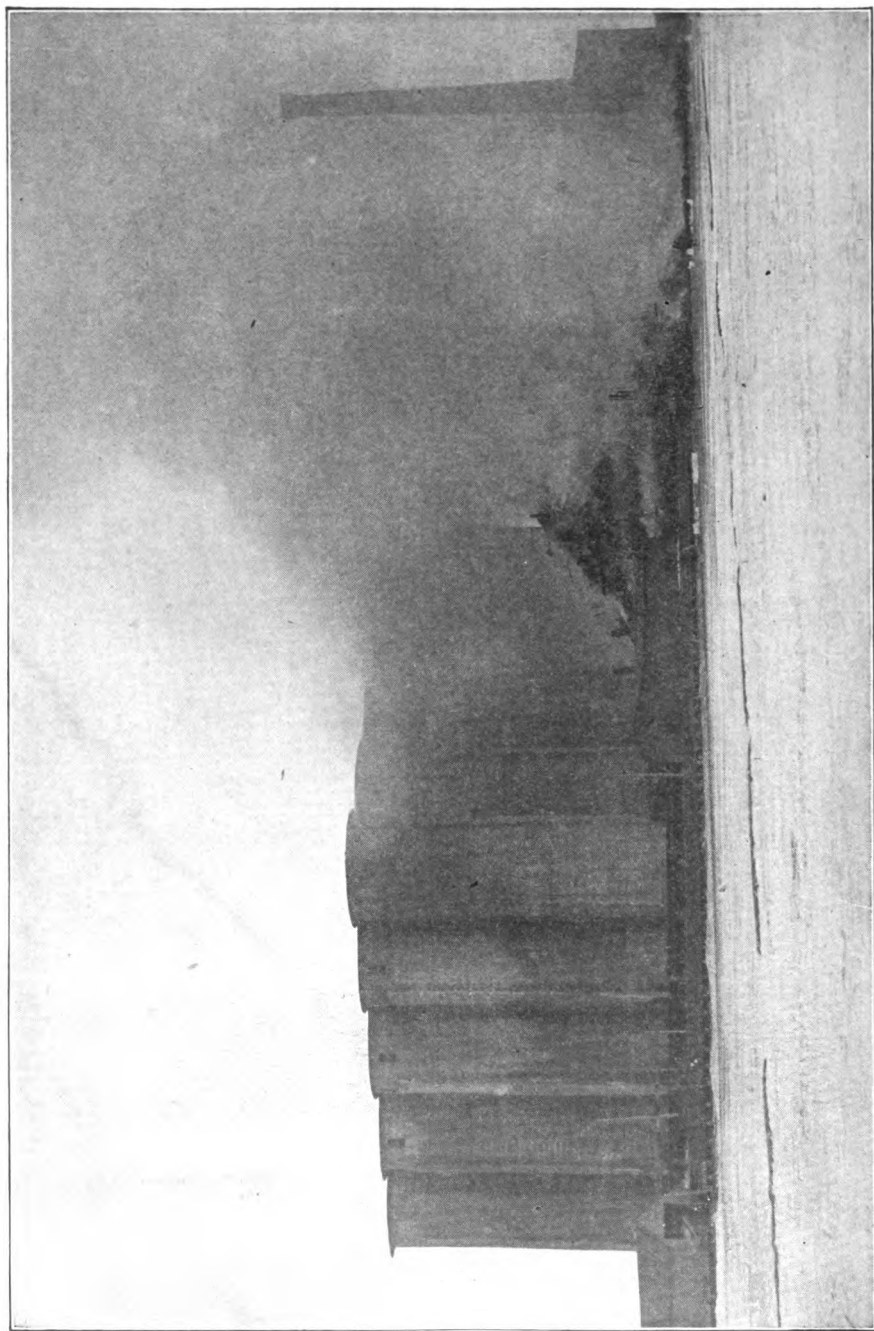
View of the Peavey Elevator Plant after the Fire. Concrete Storage Tanks were Uninjured
